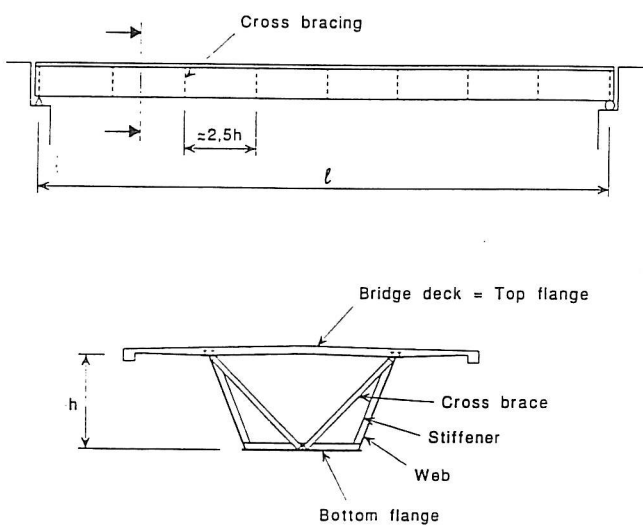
Box girder bridge with composite concrete deck: nomenclature
